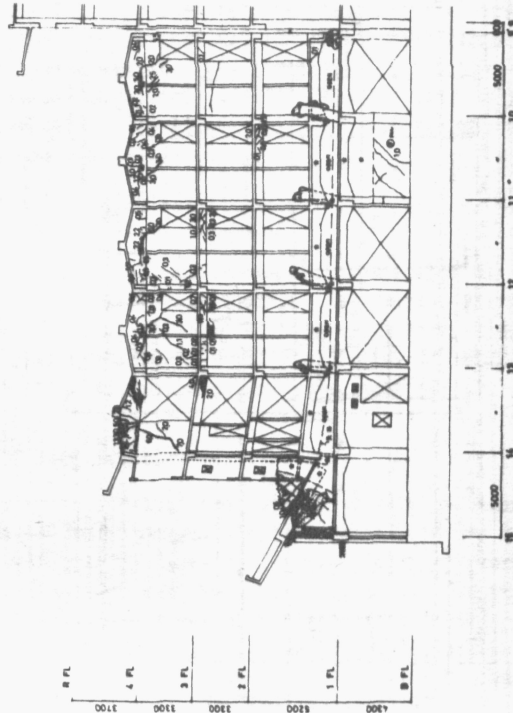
Structural Damage to Section C-C (North Elevation)
